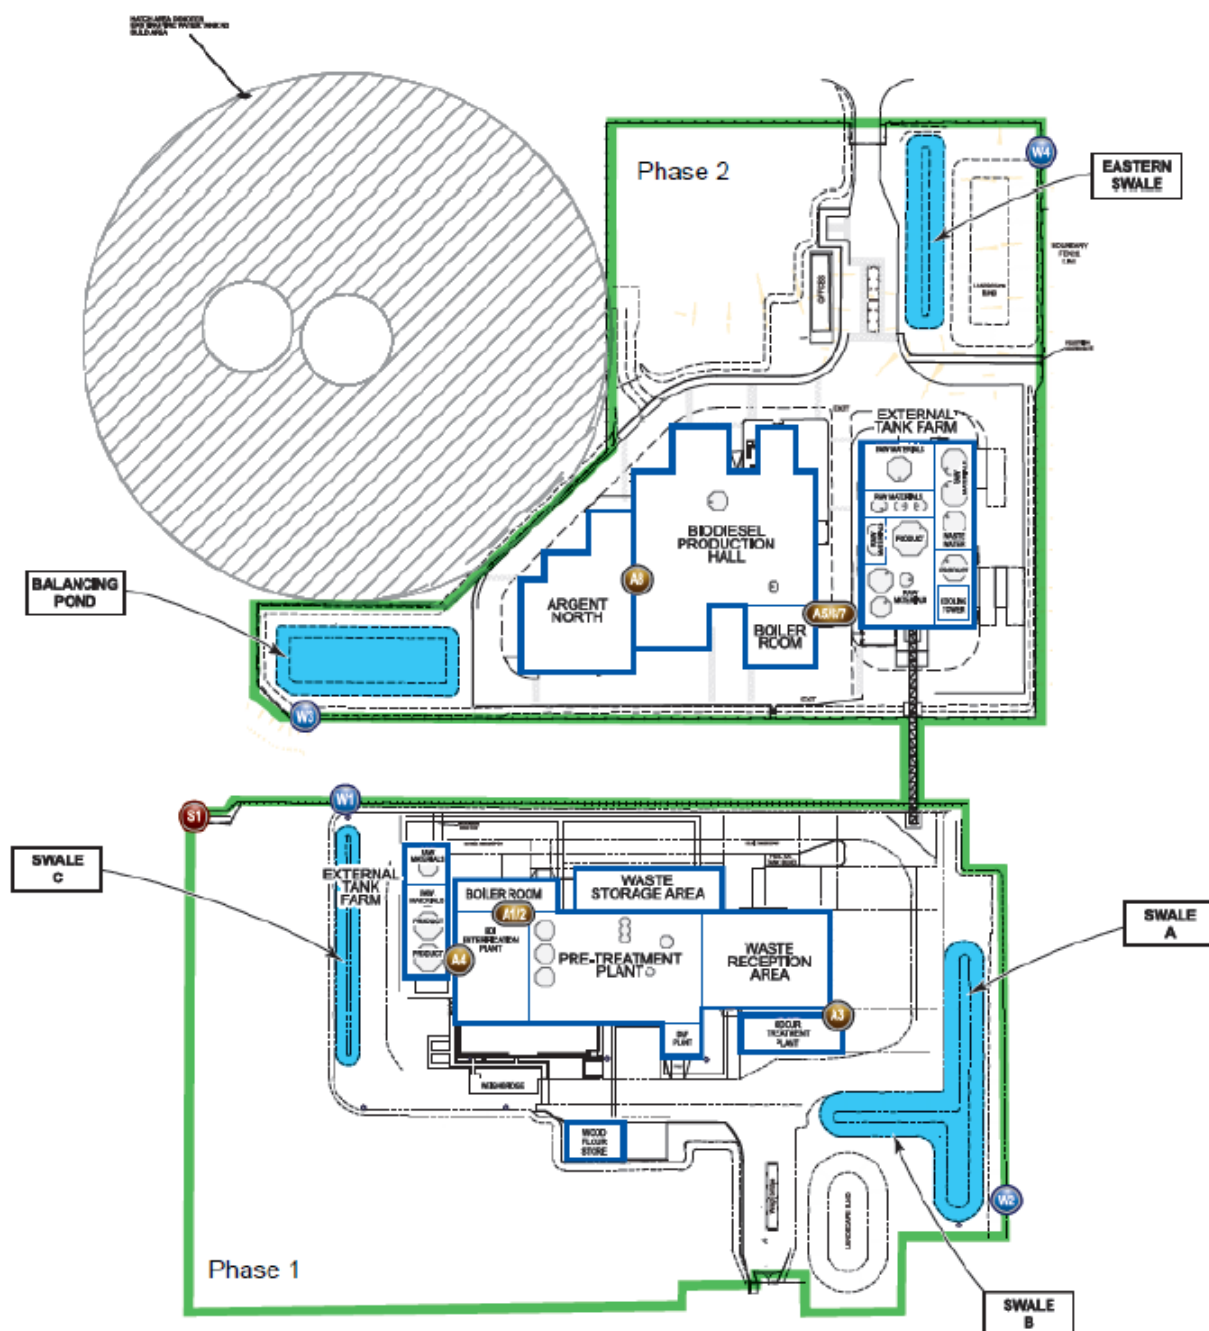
Argent Biodiesel Stanlow Plant Site Plan
